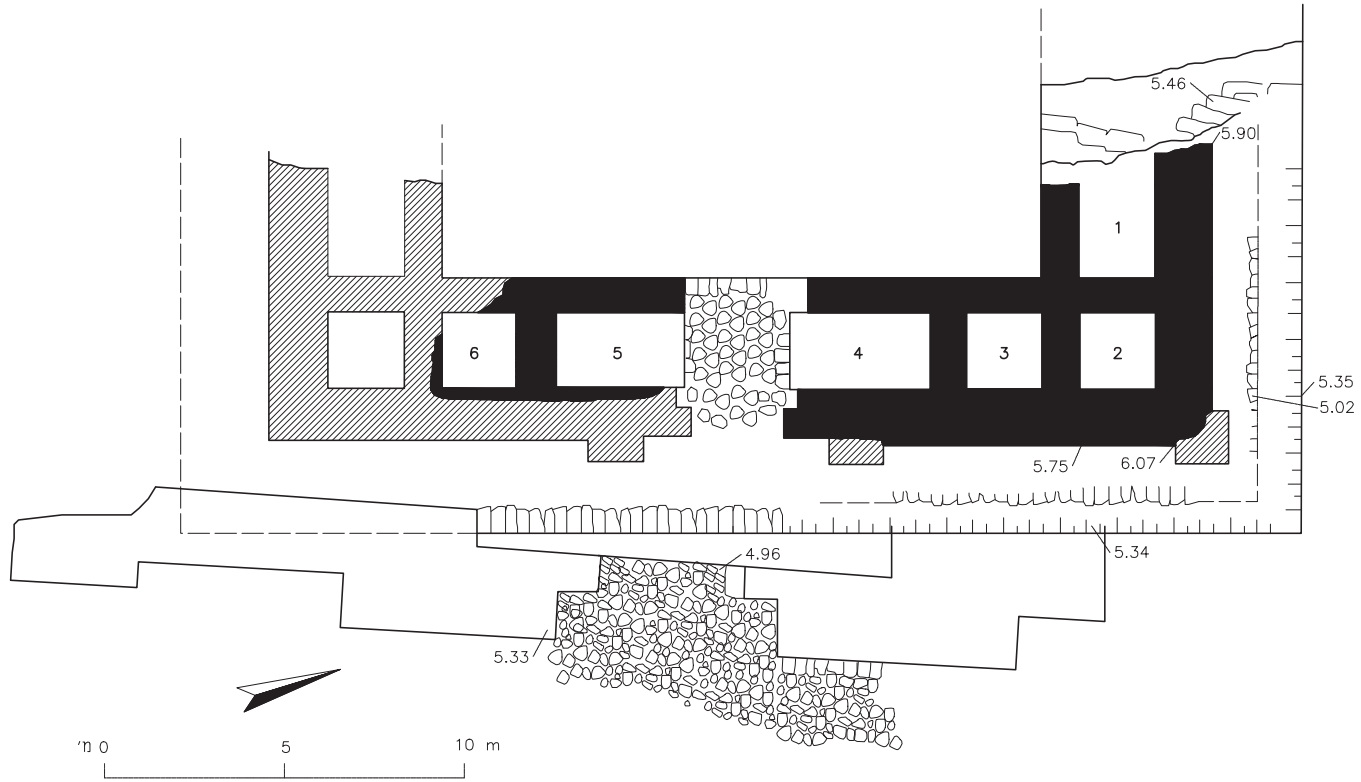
Plan of the fortress (redrawn according to archival plan and authenticated according to visible remains on the ground).
